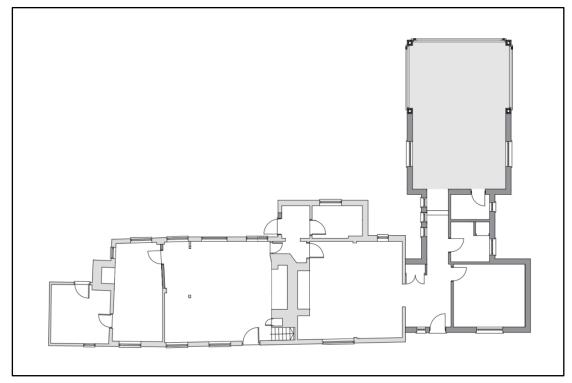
Proposed ground floor layout (Tim Moll Architecture)
